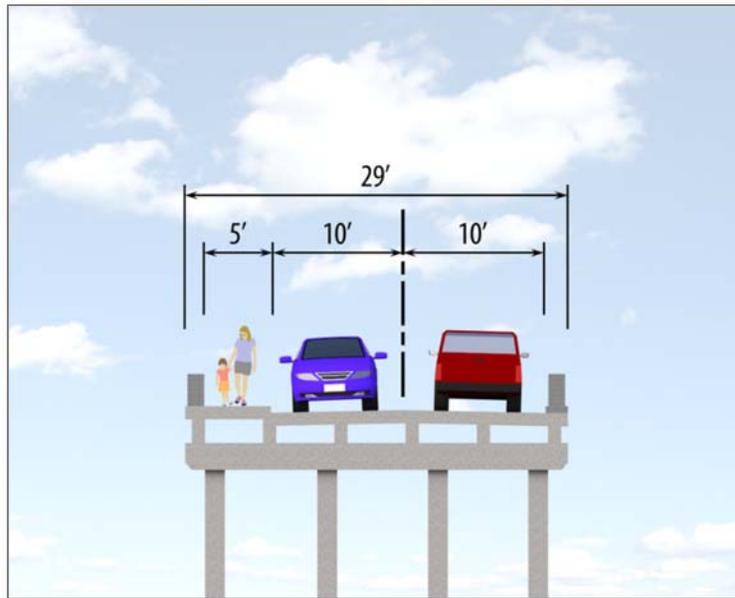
EXISTING BRIDGE TYPICAL SECTION
